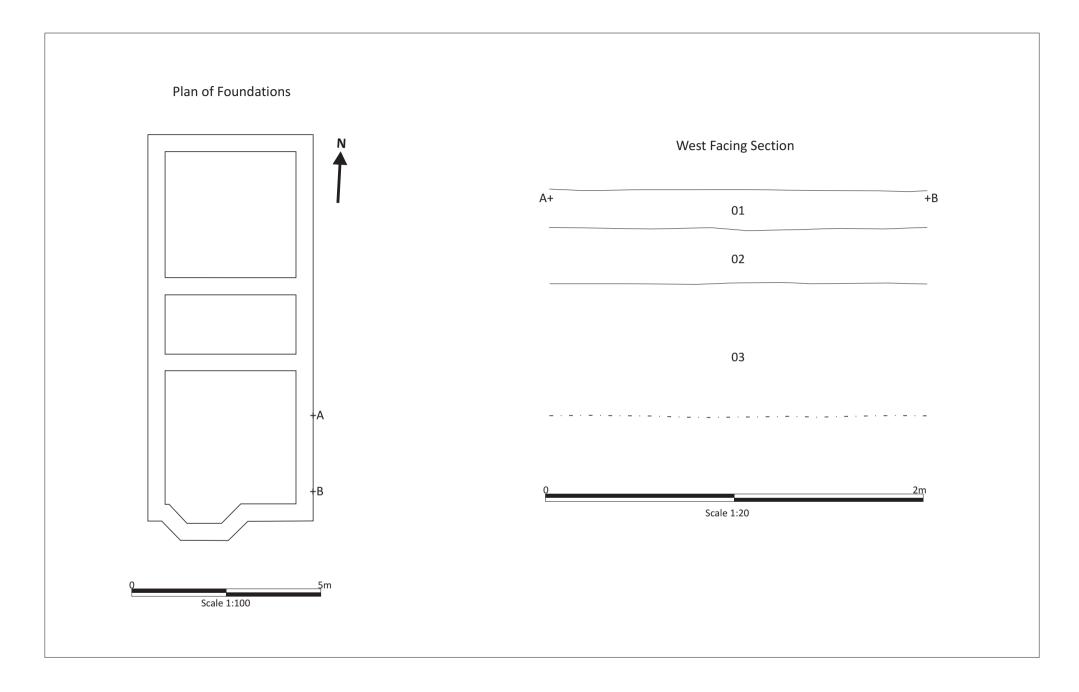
Plan of foundation trenches at scale 1:100 and sample section at scale 1:20
